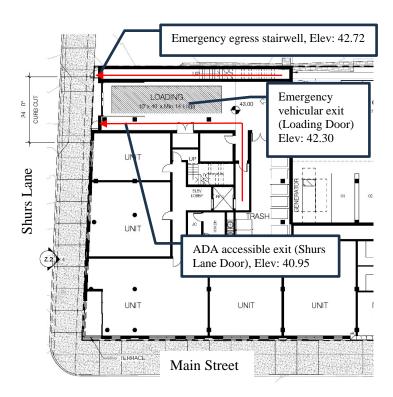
Second floor building access points (per CBP Architect 6/06/24 plans)
